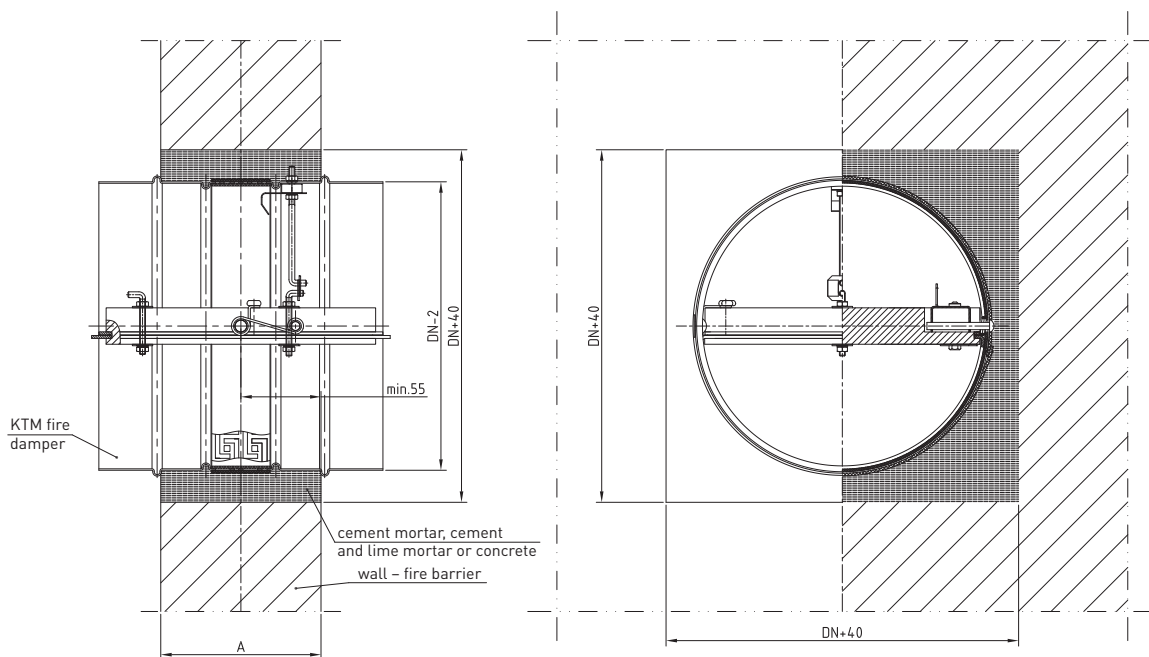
Installation of KTM fire damper (male coupling) in rigid wall barrier – variant I.
